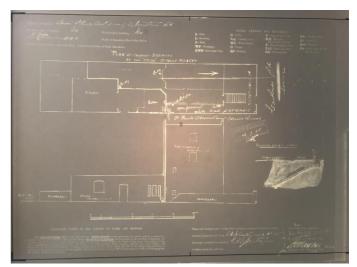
(right): 1905 Drainage Plan indicating extension to the original building
